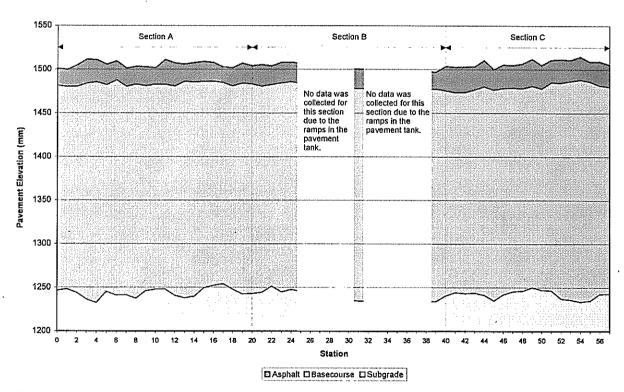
As-built longitudinal layer profiles along the pavement centreline
